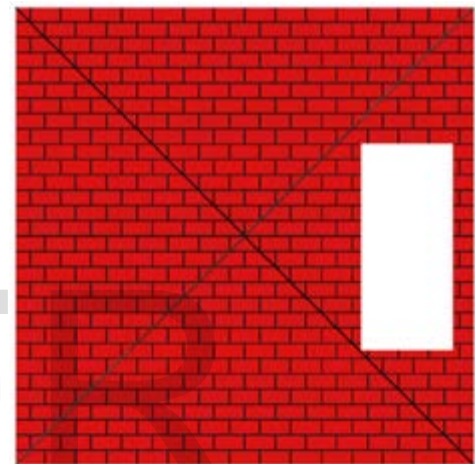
Braced Brick Masonry with circular steel rods Model
